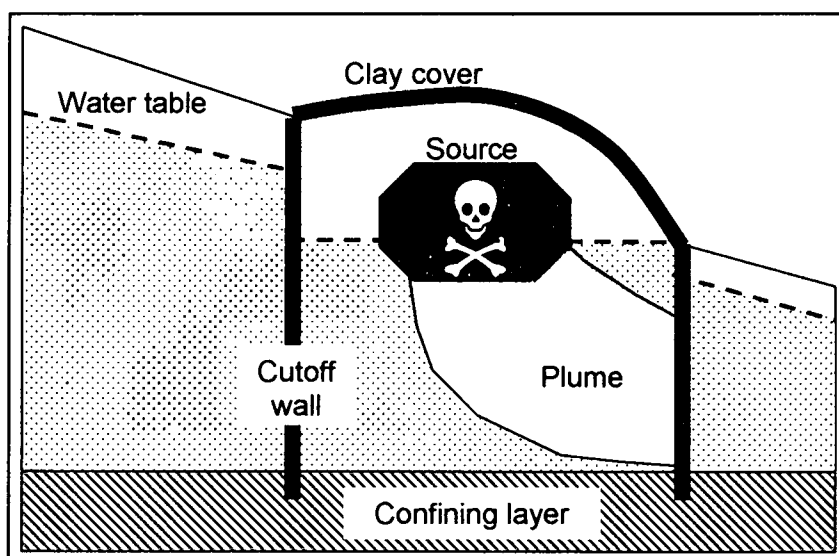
Side view of a cutoff wall surrounding contamination source and plume.
